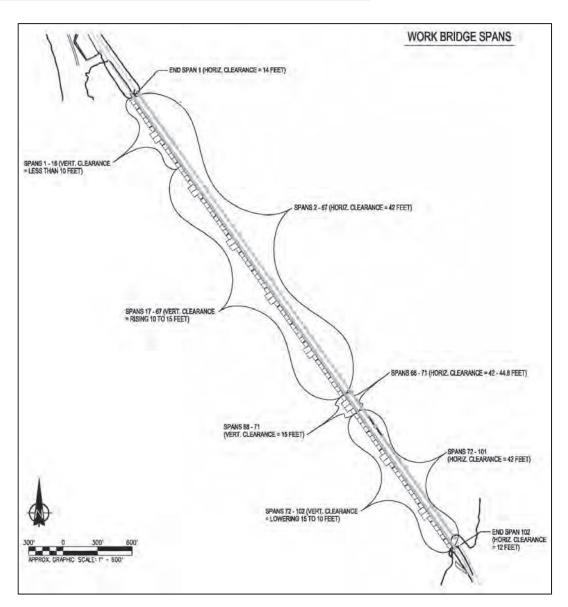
Bridge 3.9 Work Bridge Spans (Temporary)
